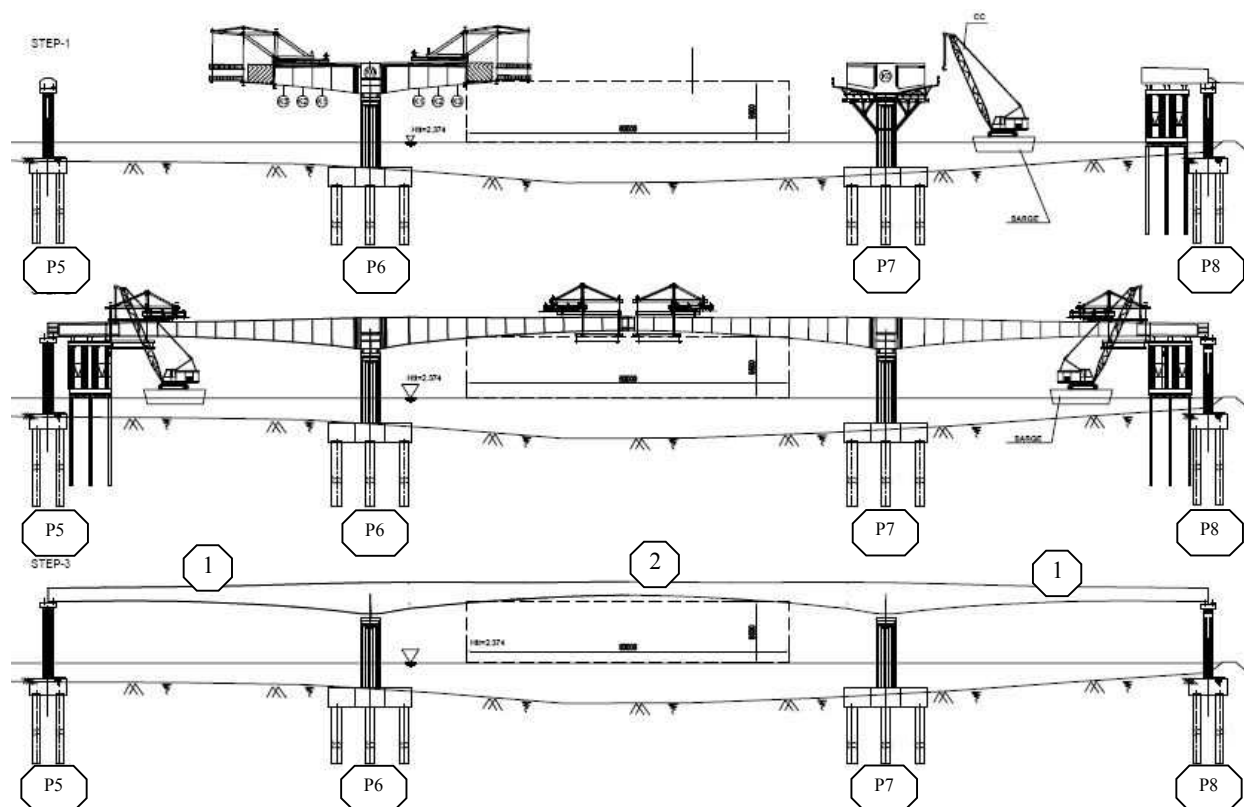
Construction of cantilever main spans of Ruot Lon Bridge
